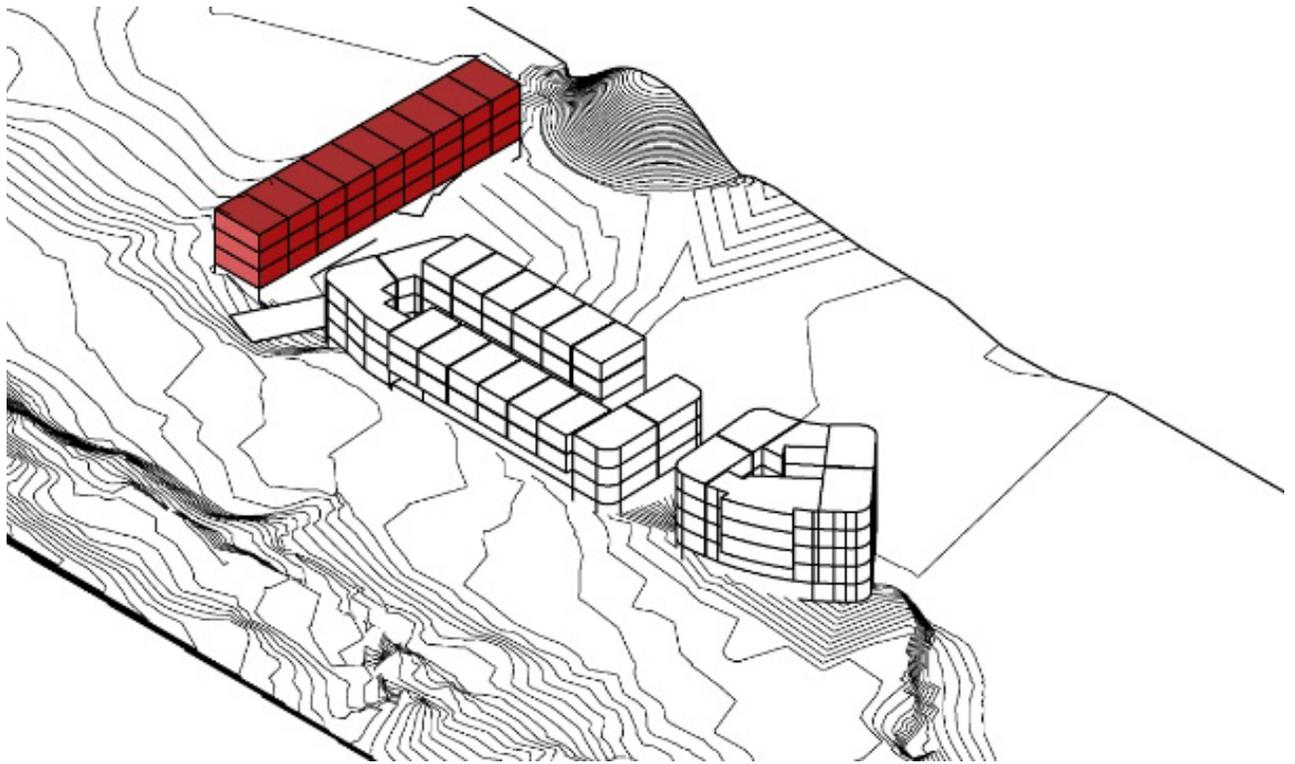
Schematic Design of Building 1. Helps to locate where Building 1 sits on the site, relative to Buildings 2 and 3.
